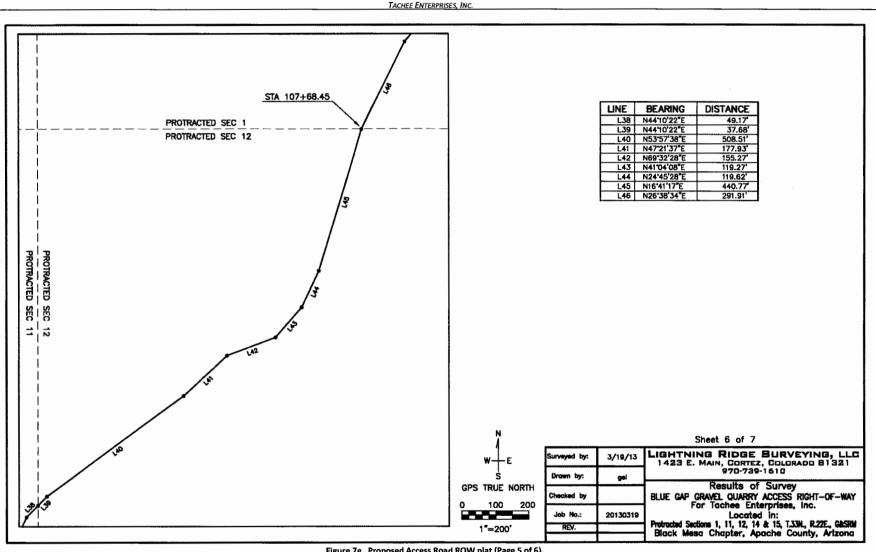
Proposed Access Road ROW plat (Page 5 of 6).
